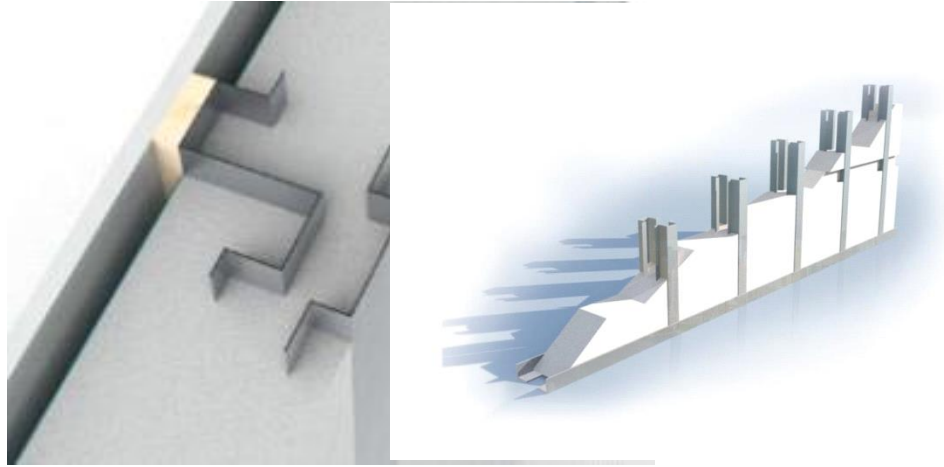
K-Tect wall systems; thermally broken wall panels with EPS core
